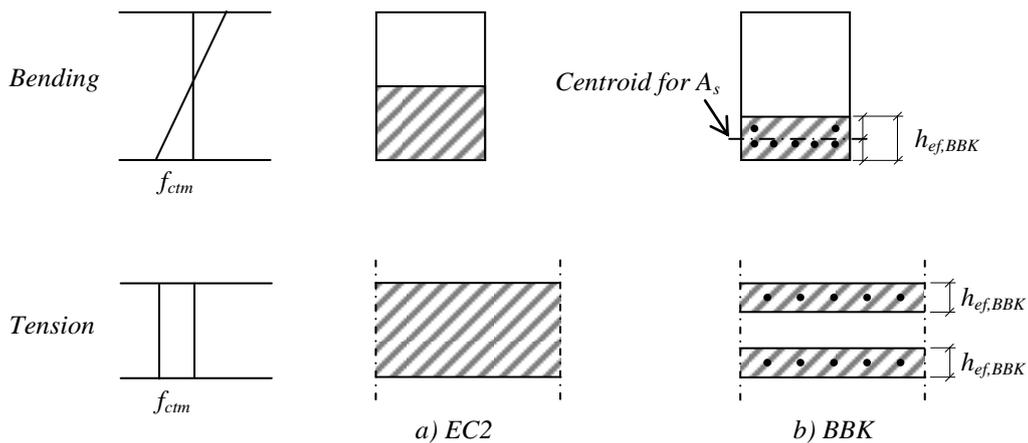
Different ways to consider the concrete area in tension for calculation of minimum reinforcement for crack control, a) concrete area in tension prior to cracking, A_{ct} , according to Eurocode 2, b) effective concrete area, A_{ef} , according to BBK04.
